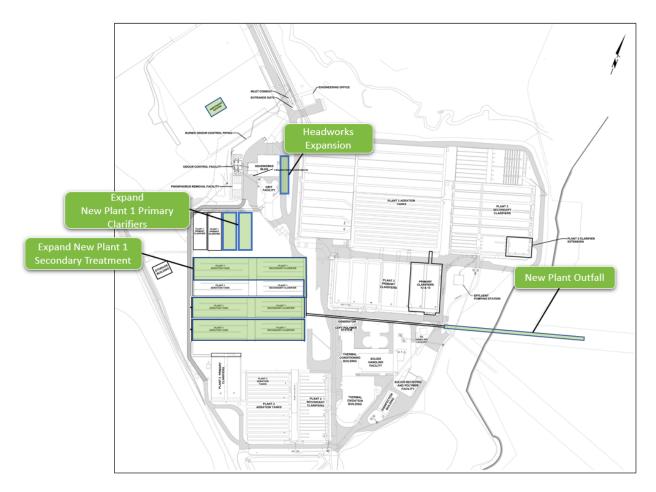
Site Plan for Expansion to Rated Capacity of 600 ML/d
